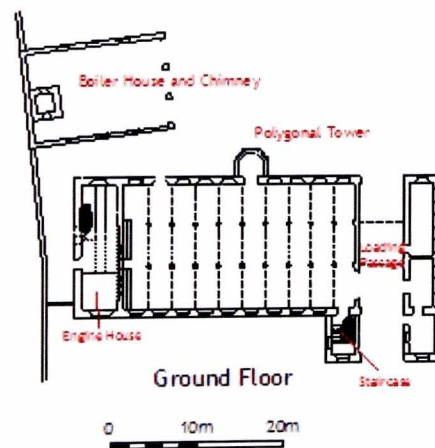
Plan of Old Lane Mill, Northowram, showing staircase located in the wing
